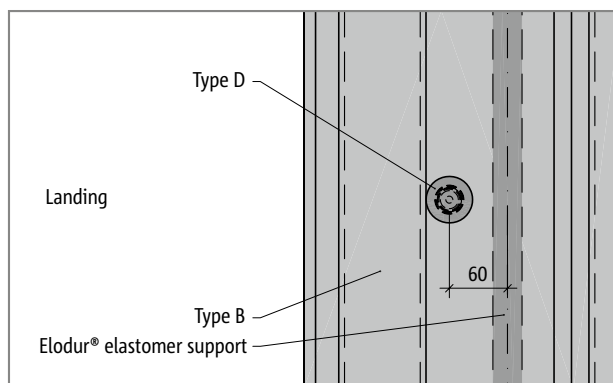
Schöck Tronsole® Type B + type D: Detail A
